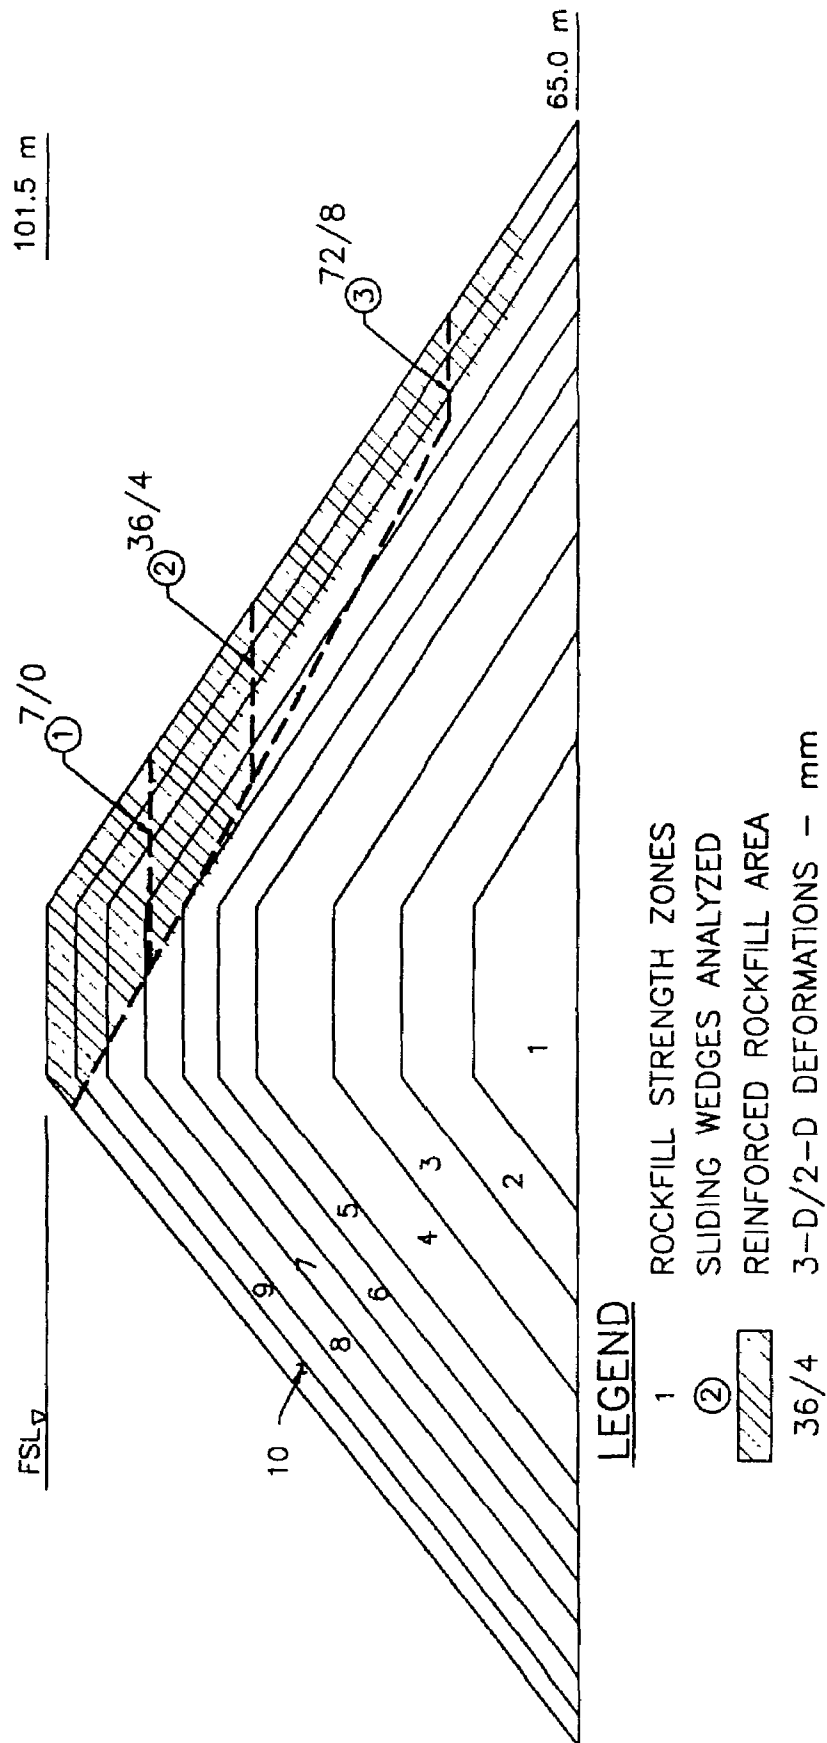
Sliding Wedges Analyzed – Reinforced Section
